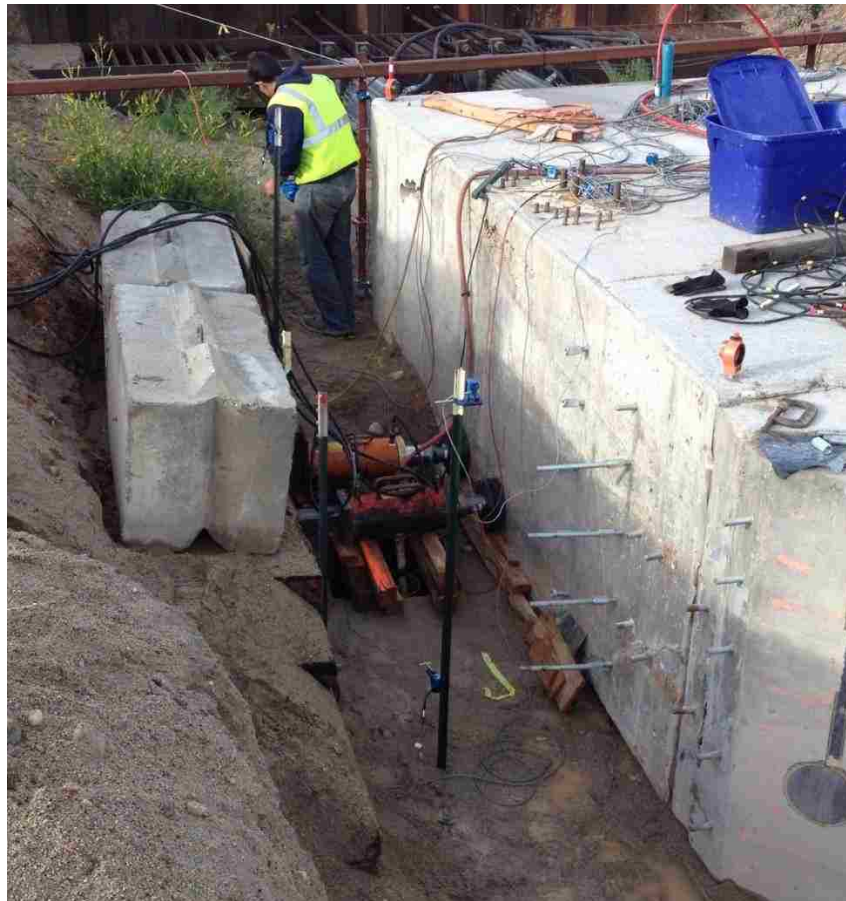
The transverse loading test set up when performed on the 45° skew.
